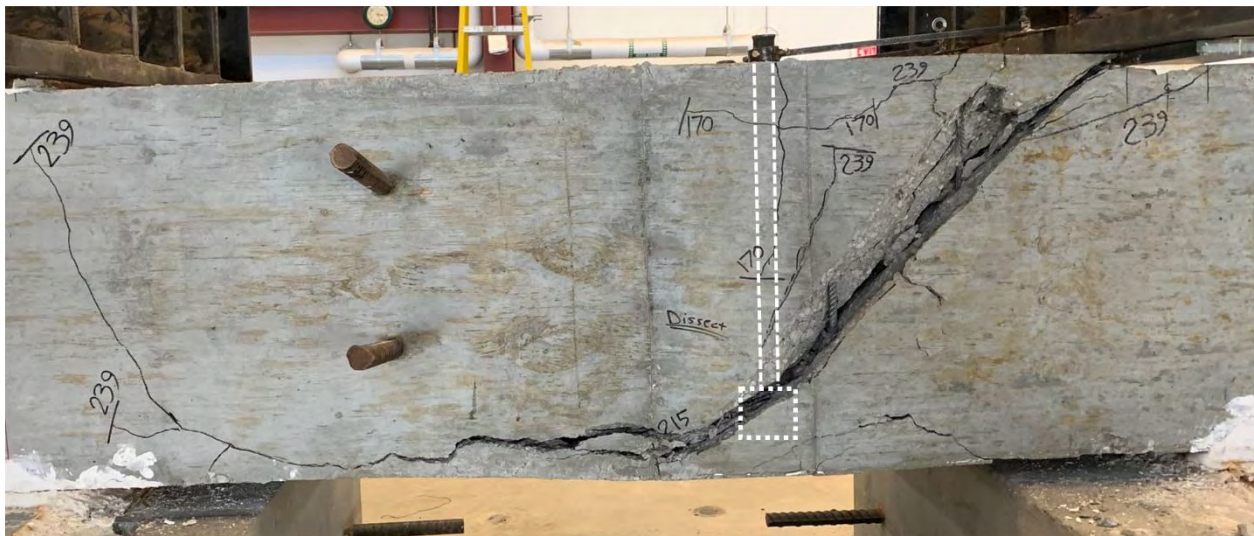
Shear-like failure in headed-bar specimen 14-16. (Note: The specimen shows no indication of a breakout or side-splitting failure.)
